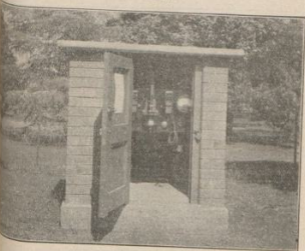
High Tension Scheme. Switch Cubicle of Outdoor Substation.
